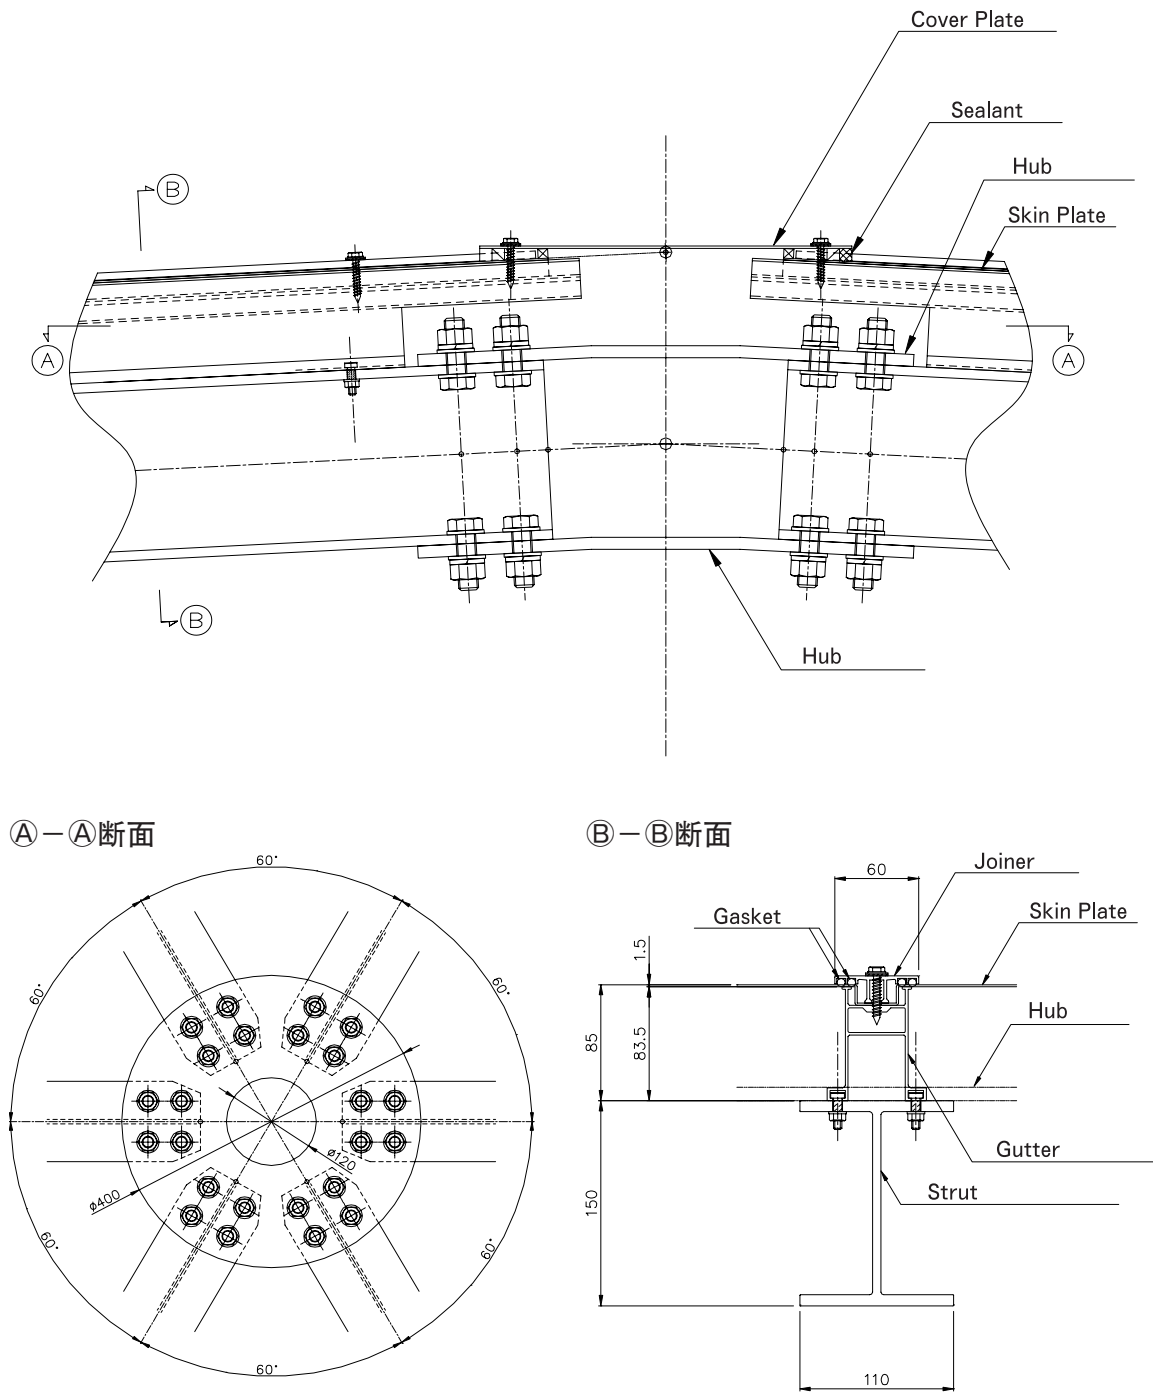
Structure of the water proof connecting part of Dome-Truss.
